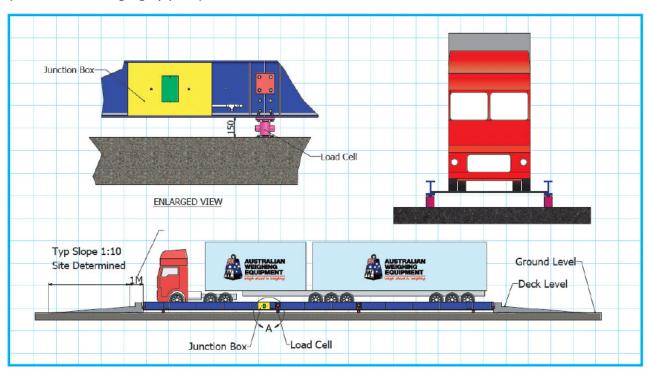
Typical quarry weigh-bridge: technical details
